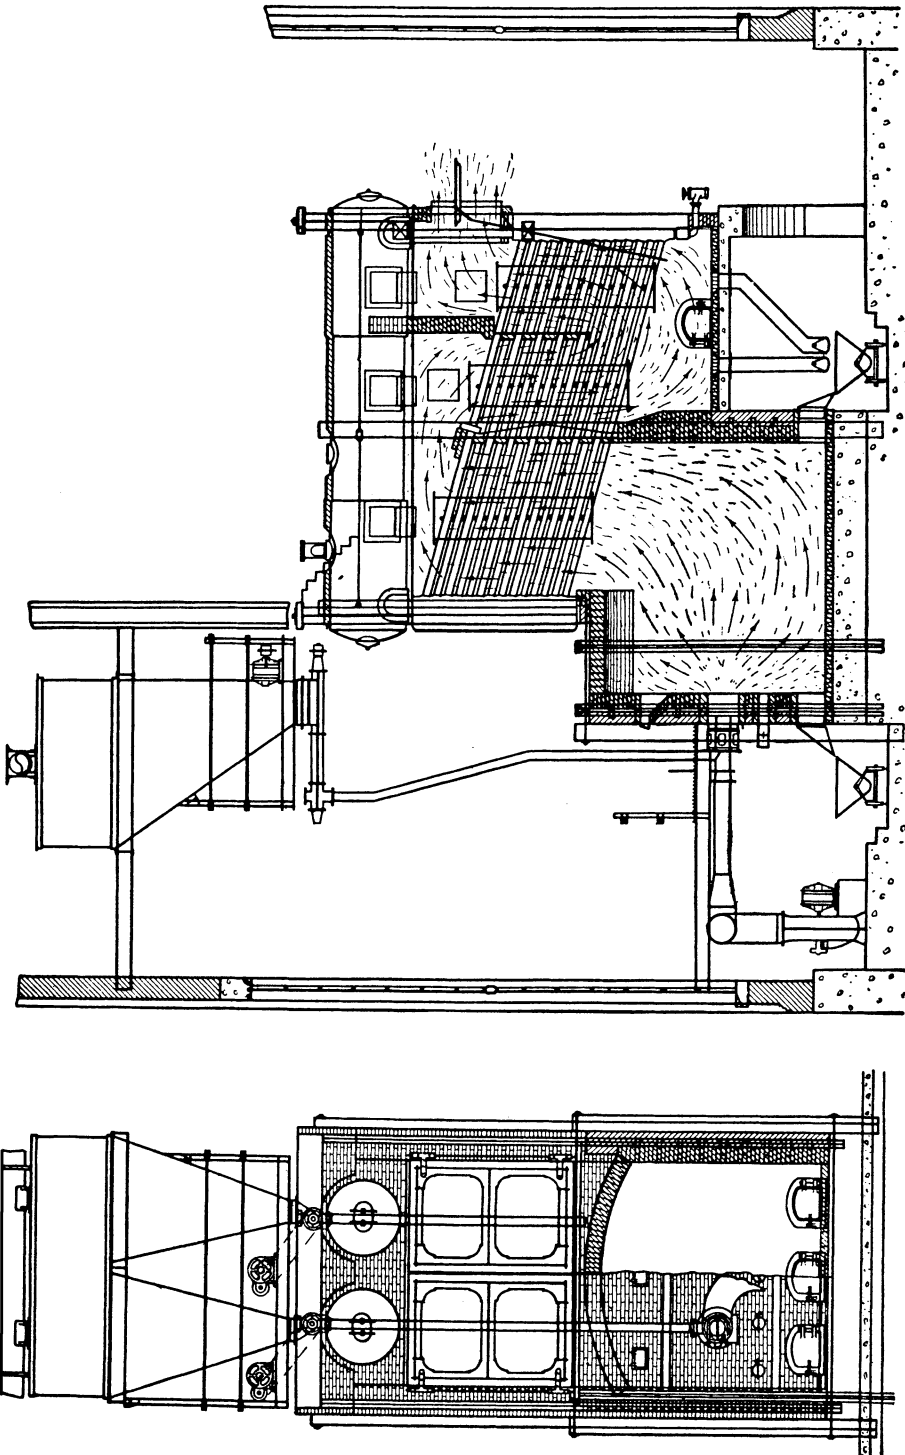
500-horsepower Babcock & Wilcox boiler, arranged for pulverised-coal firing. Fuller Engineering Co.
